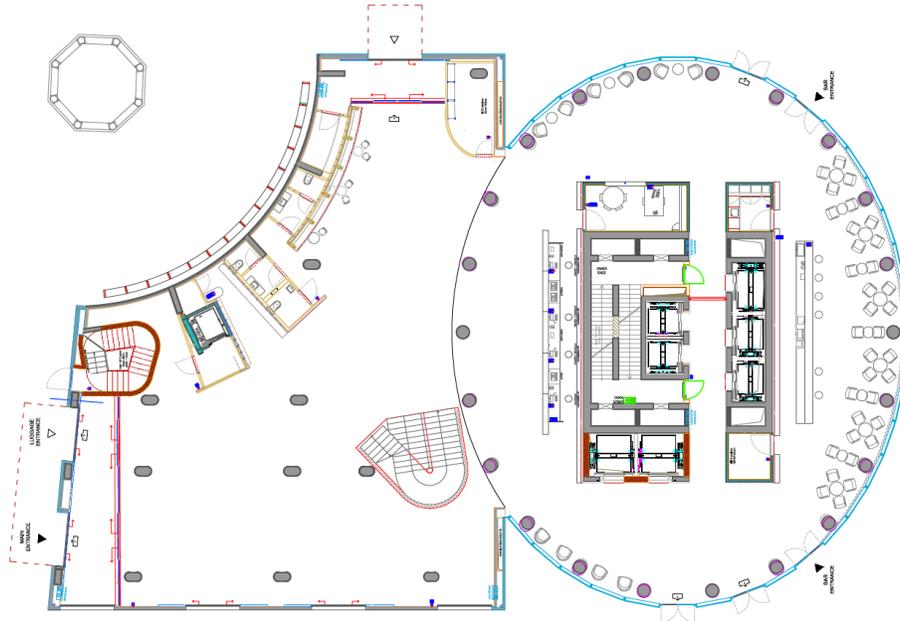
Ground Floor Plan Layout (Entrances, Lobby, Reception, Lobby Bar etc.)
